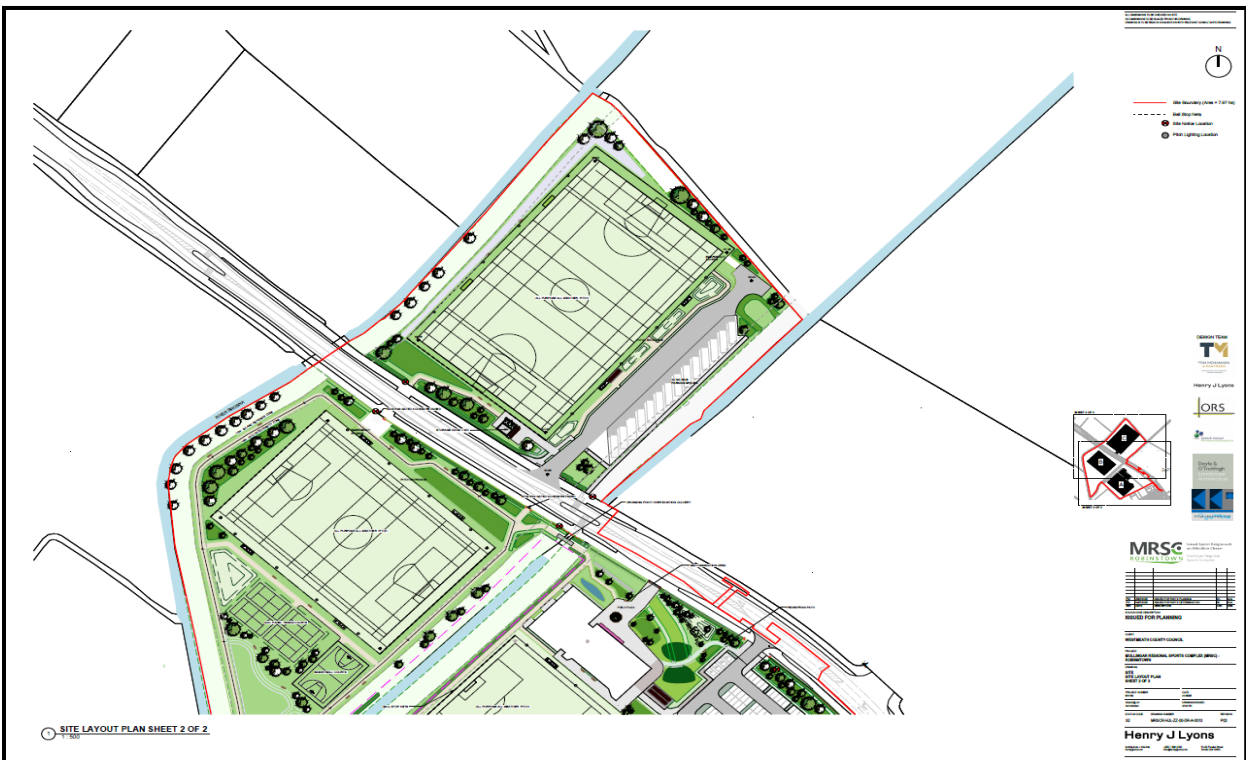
(b): Proposed development layout at Robinstown site (HJL Architects)
